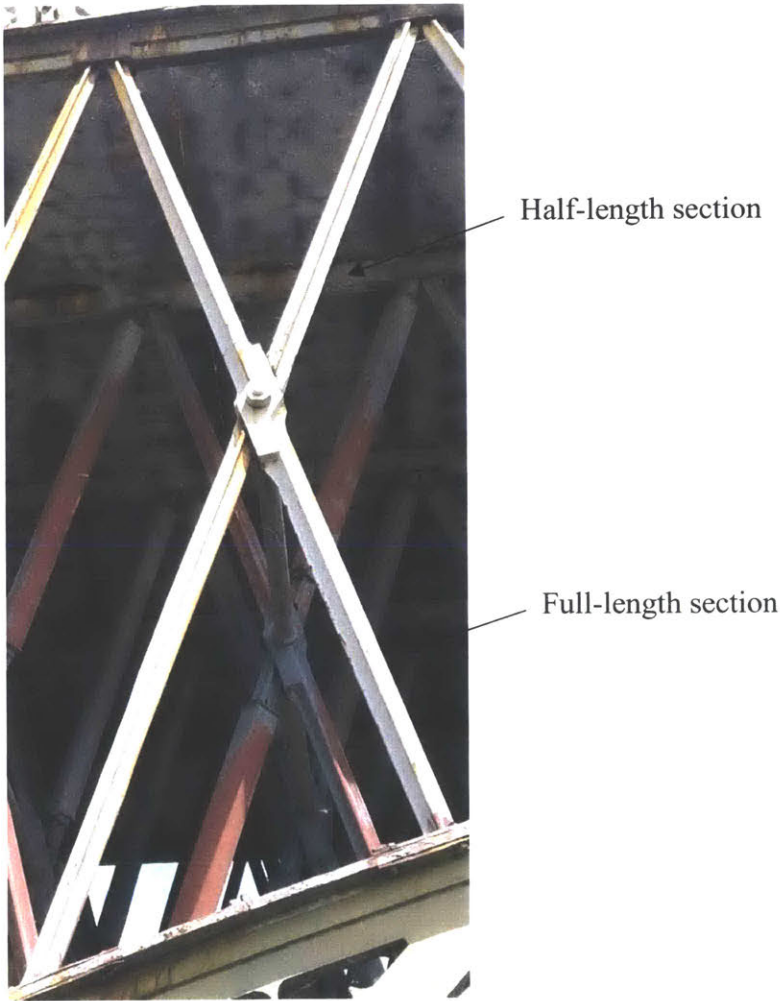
Brace construction, showing midspan connection and lateral bracing - Mythe Bridge
